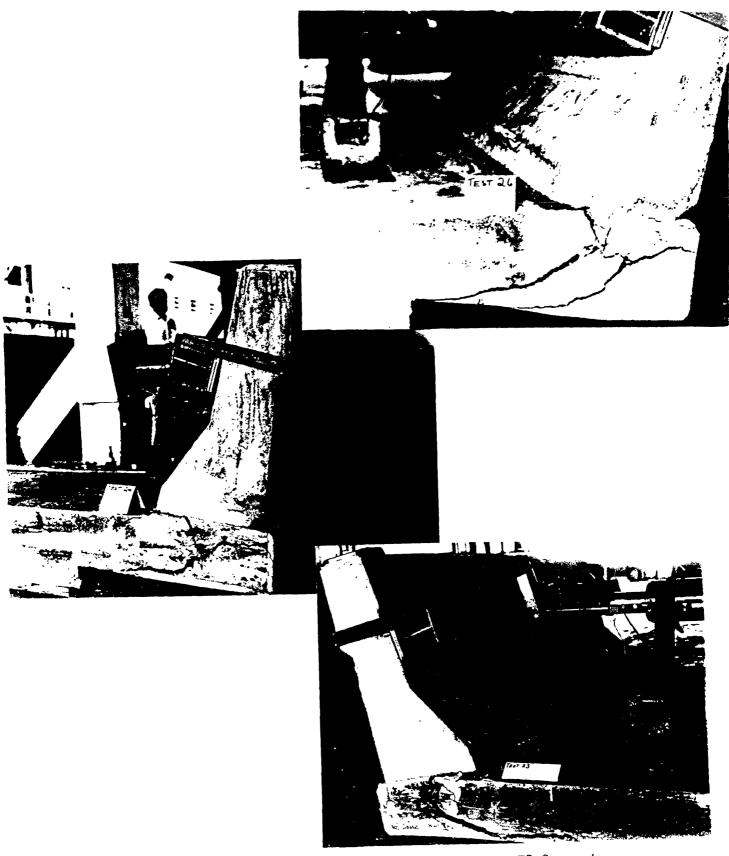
Typical Crack Patterns for Texas T5 Concrete Post and Bridge Deck.
